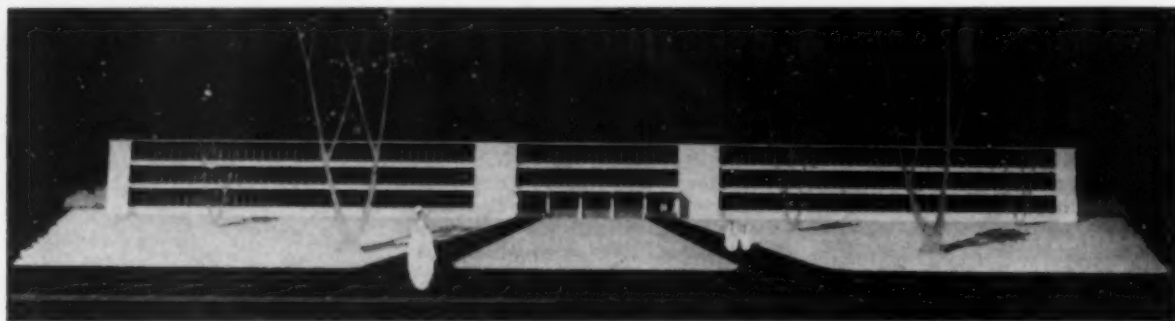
Simplicity of structural layout and large floor area recommended lift-slab method of construction for U. S. Navy barracks at Norfolk, Va.
